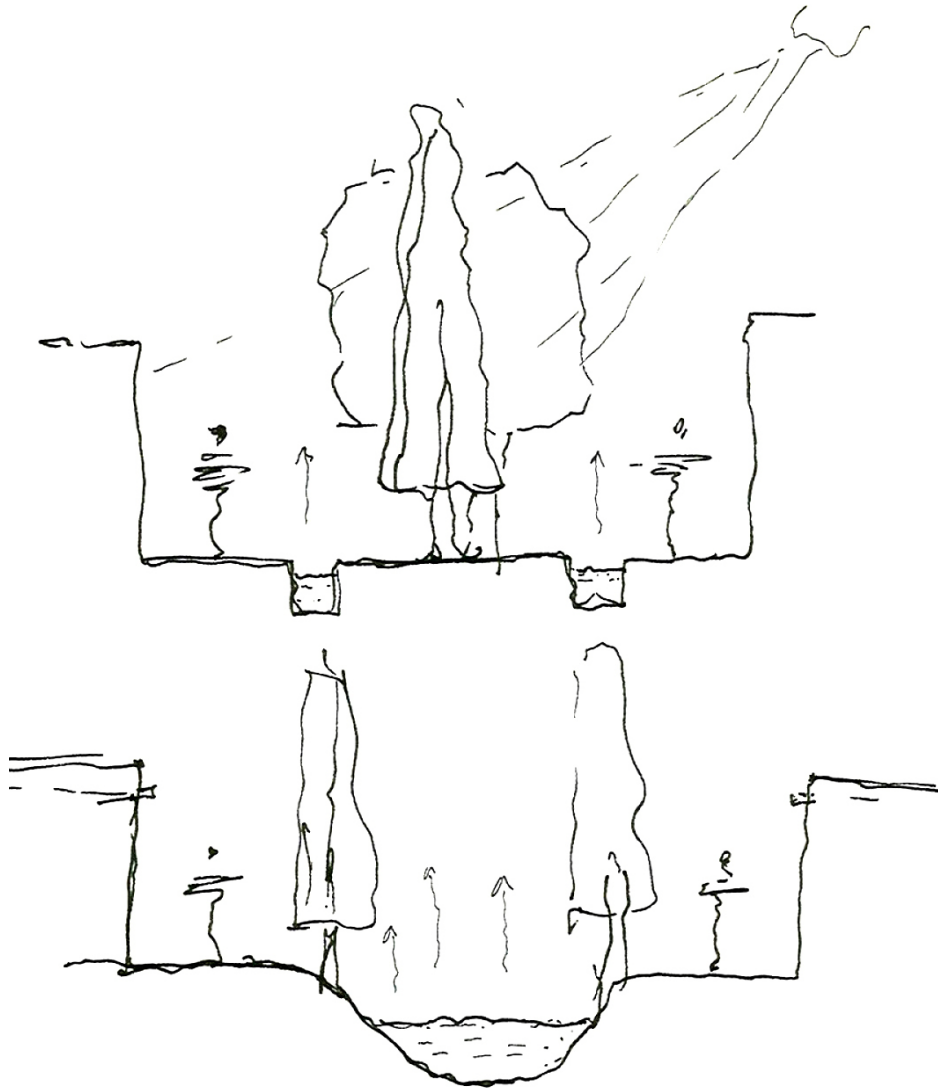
Sketch of tree-lined alleys and narrow streets with *juys* or open gutters (source: Author 2013)
